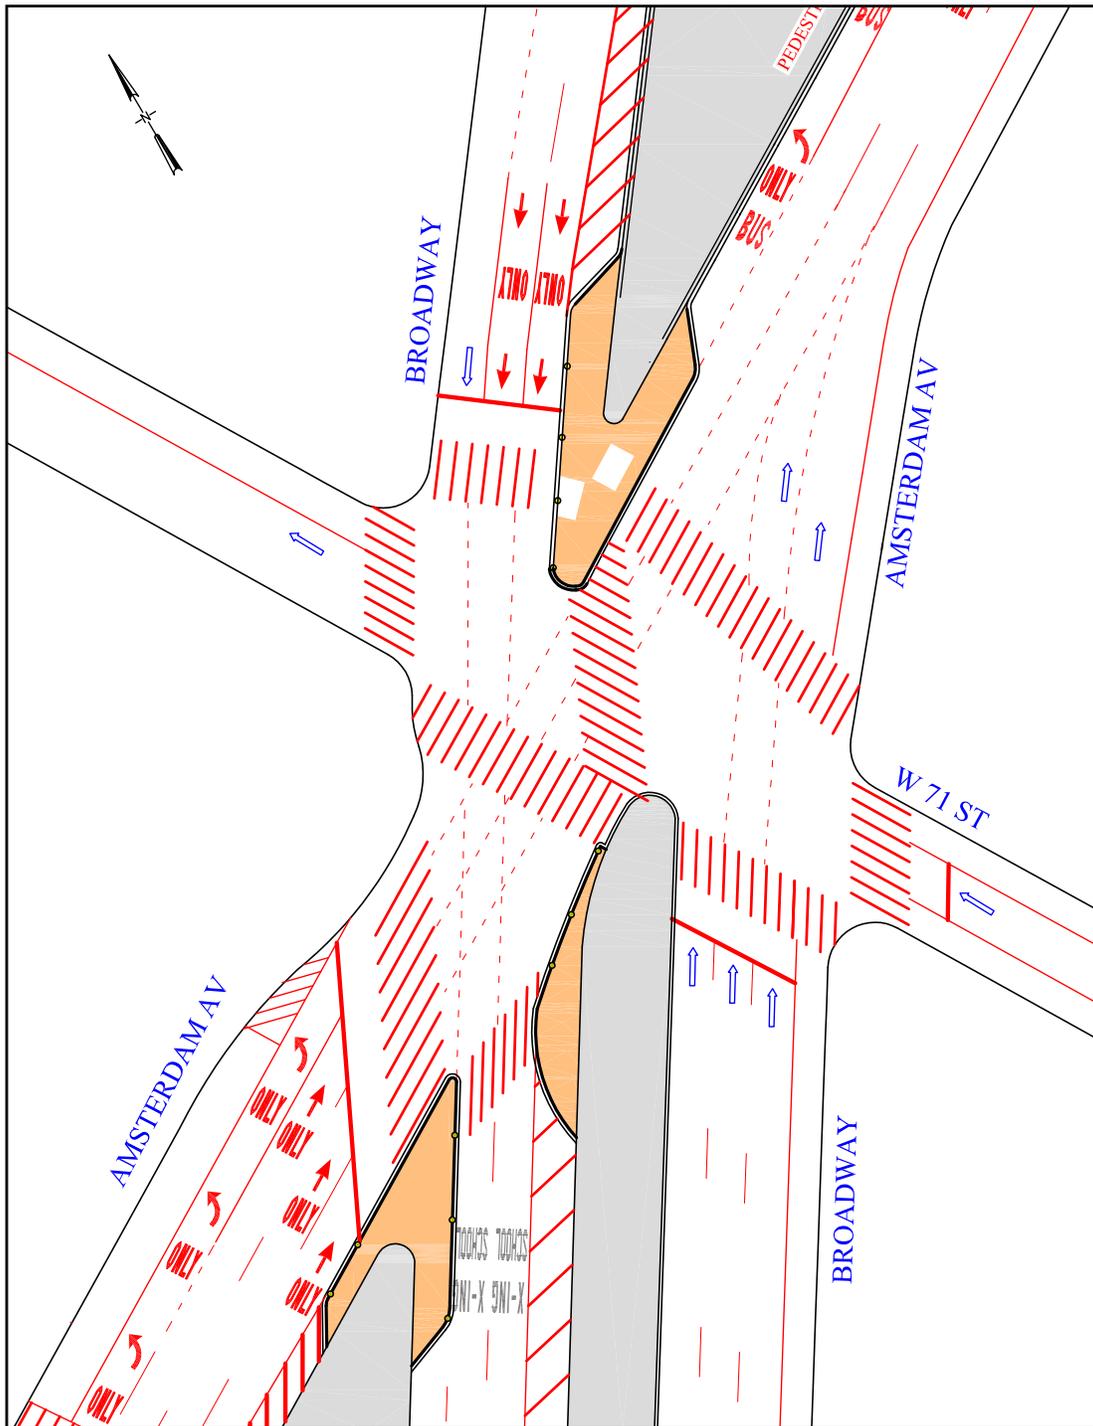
Broadway/West 71st Street/Amsterdam Avenue (Existing Condition)
